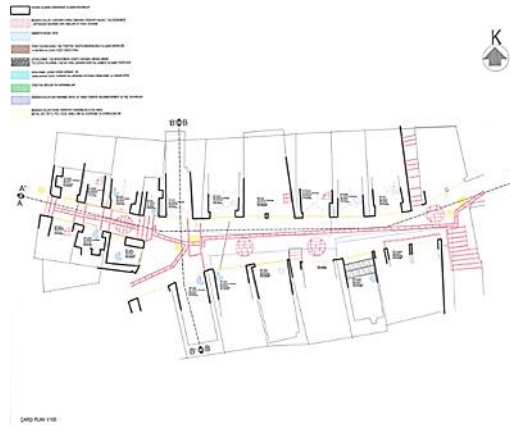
Kuyumcular Jewelers Bazaar floor plan [8]
